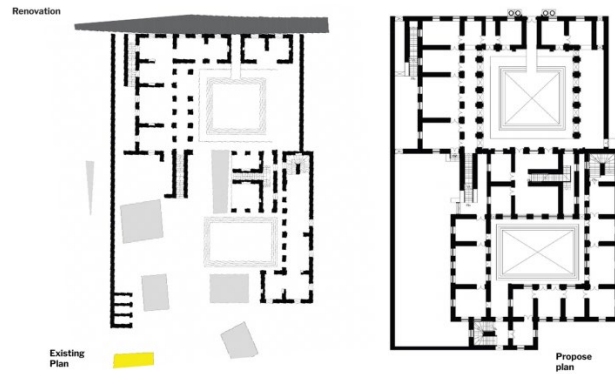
Shows: Existing and proposed plans of Haque House for a selected adaptive-reuse case. Building name, floor level, north arrow, scale, room labels and retained/new/removed elements should be added.
